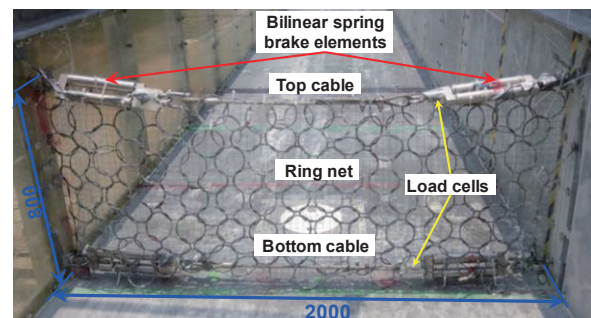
Upstream front elevation of model flexible barrier with two brake elements per cable.
